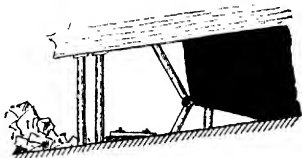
Section across Face of 5-ft Seam worked by Longwall
